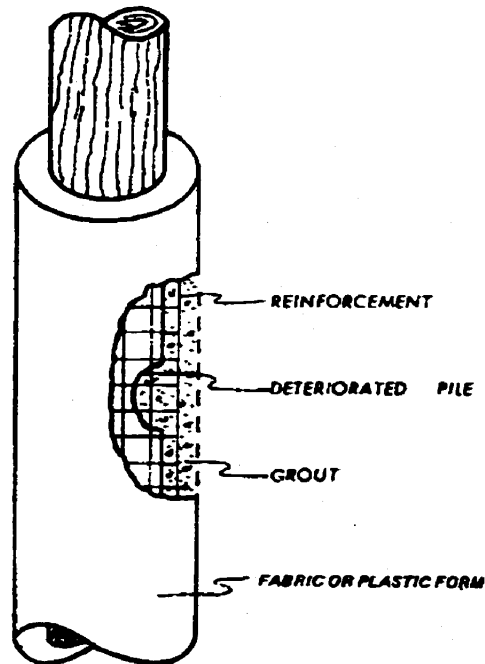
Reinforced Concrete Jacketed Timber Pile (Avent, 1986)
